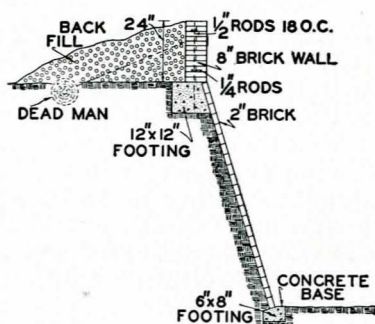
A 2-inch brick wall below grade, 8-inch wall above. If reinforcing rods are not used, dead men should be buried at 8-foot intervals.
